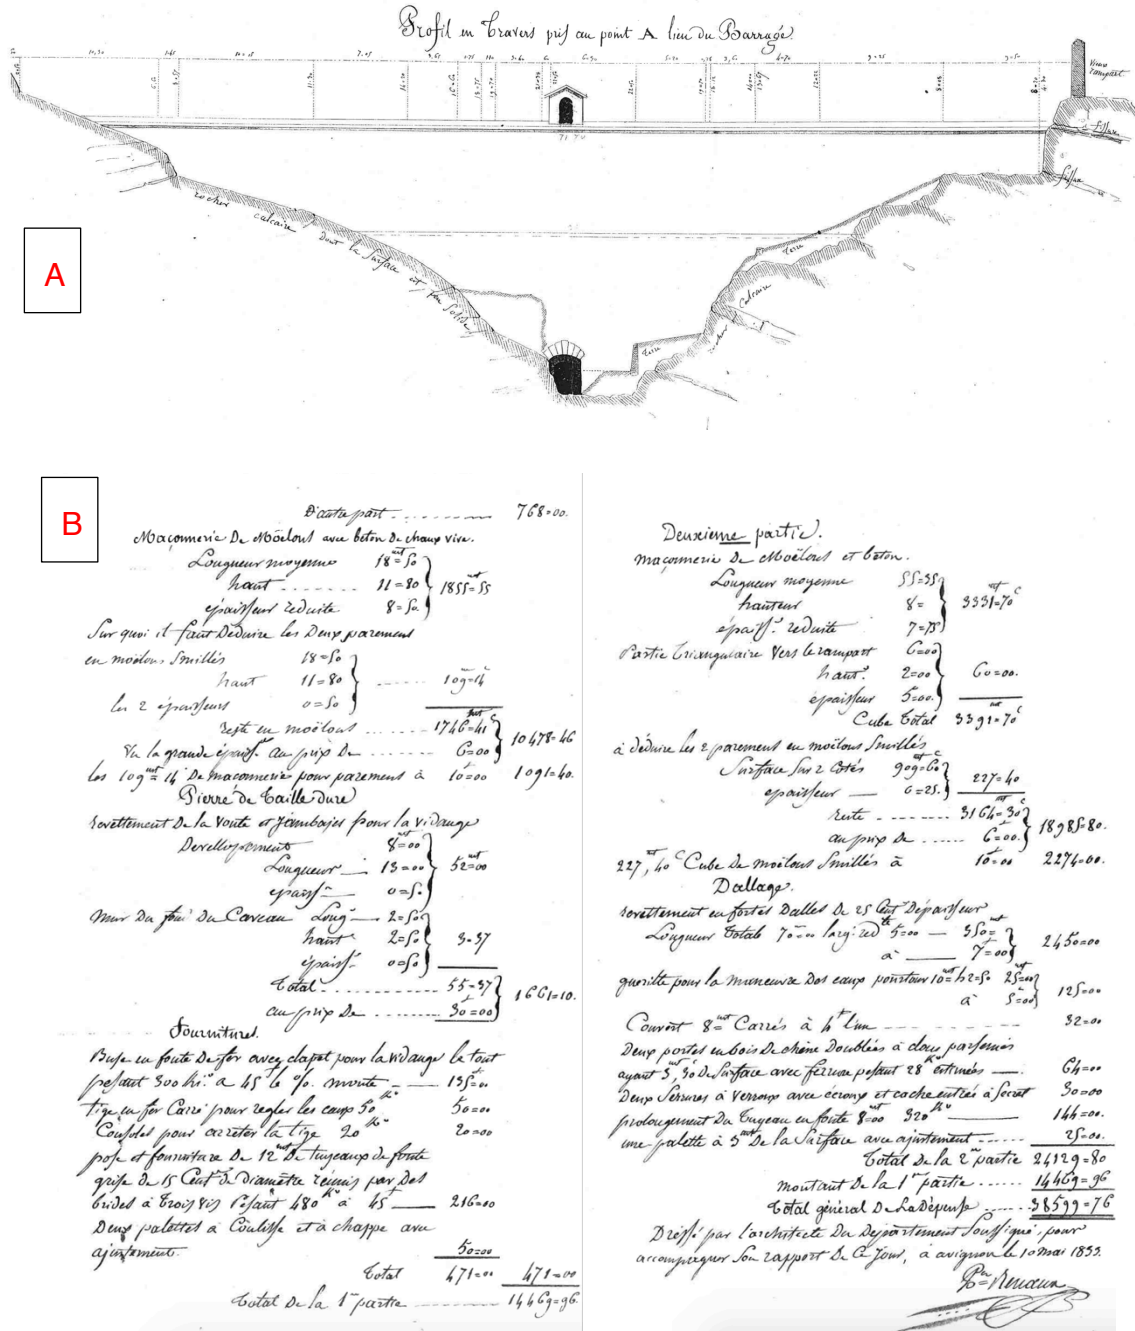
2 (A) Plan of the old dam and (B) construction budget with details of the materials used. Source: City archive of Saint-Saturnin-les-Apt.
